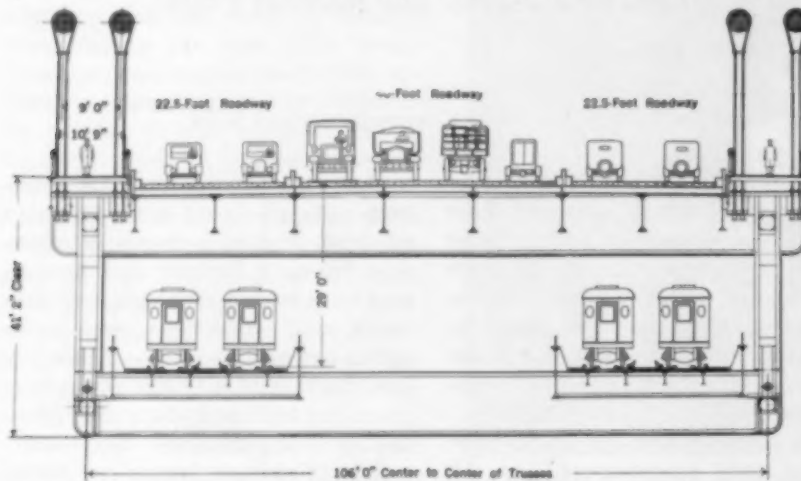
SECTION THROUGH THE GEORGE WASHINGTON BRIDGE, NEW YORK
